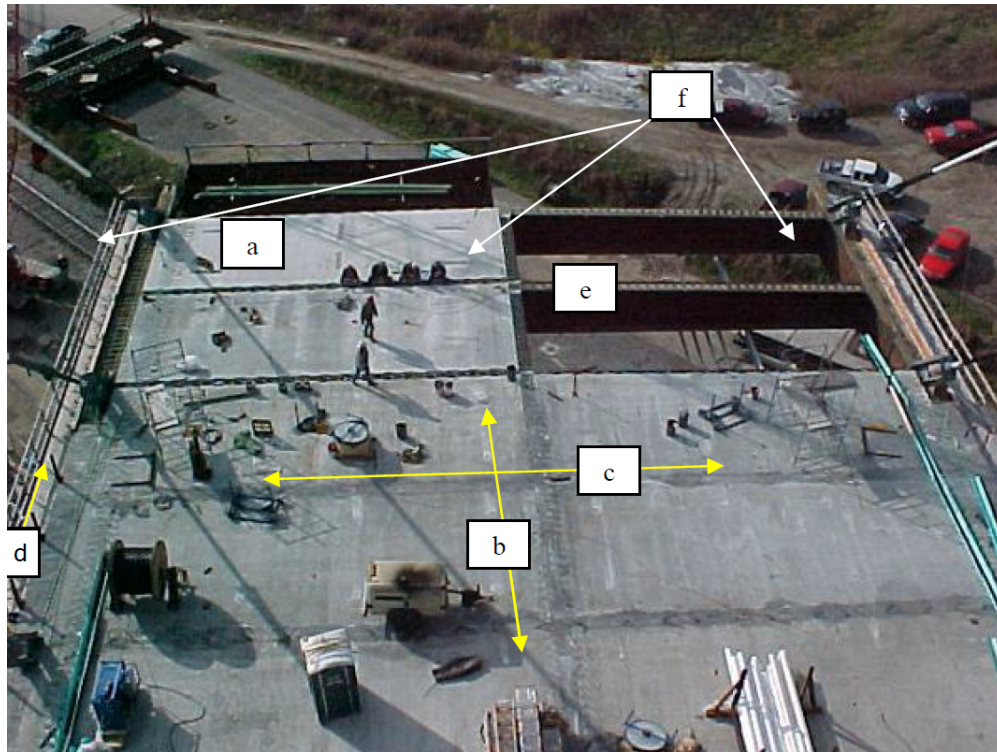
Construction-stage top view of the Bill Emerson Memorial Bridge deck system, identifying the main deck components: (a) typical precast concrete deck panel, (b) cast-in-place longitudinal joint, (c) cast-in-place transverse joint, (d) short cast-in-place cantilever region, (e) typical transverse floor beam, and (f) longitudinal girders[7].
